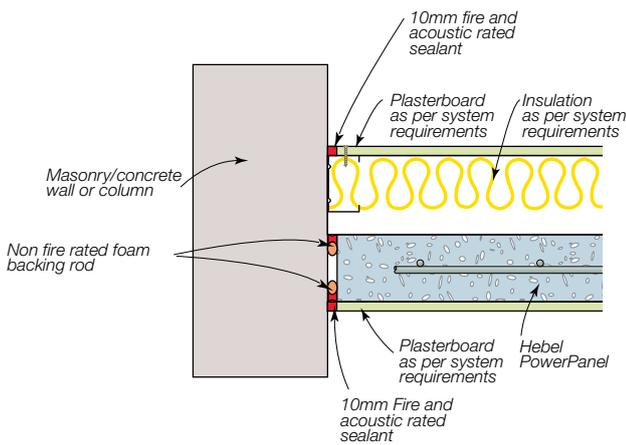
Wall to column junction - Intertency Walls or Common Walls Option 6
